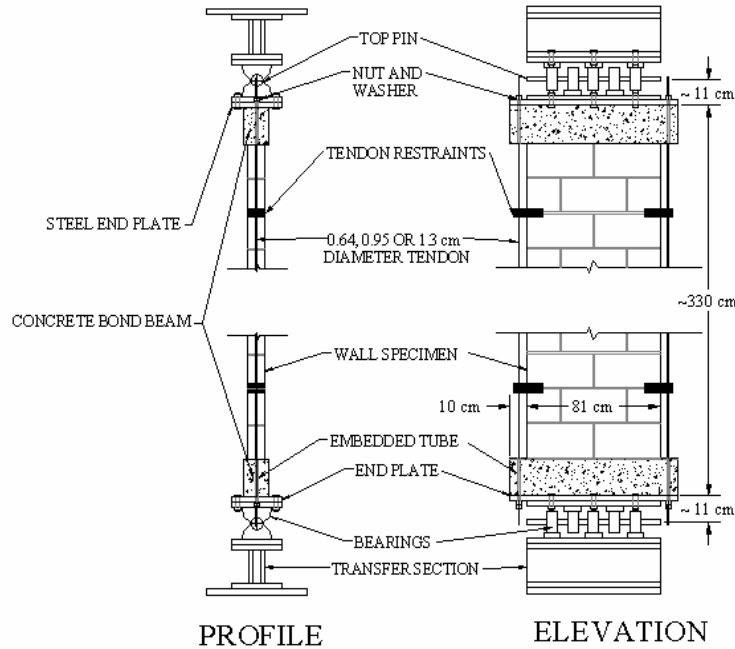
Vertically-Spanning, Simply-Supported Wall Specimens
